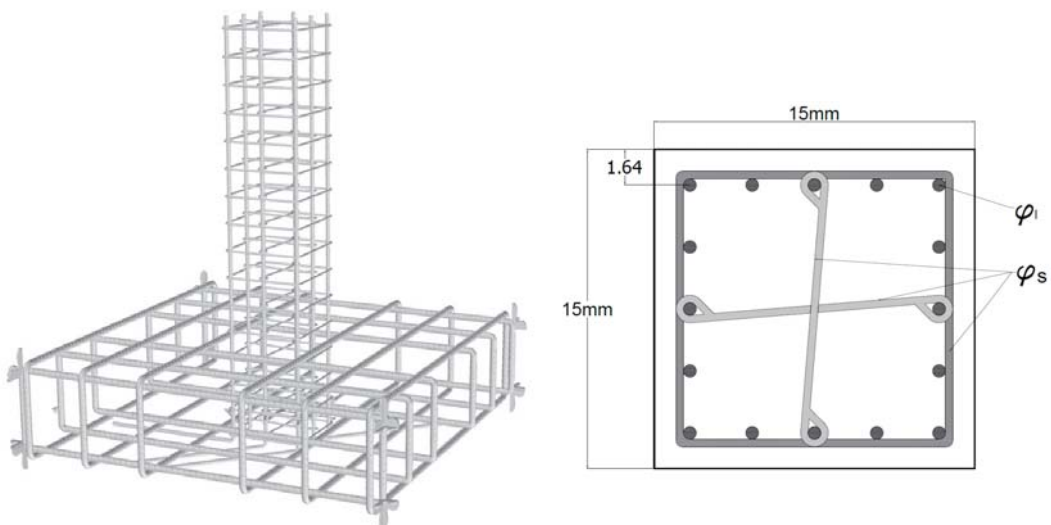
Left: 3D model of the 3D printed reinforcement. Right: Cross section and reinforcement layout.
